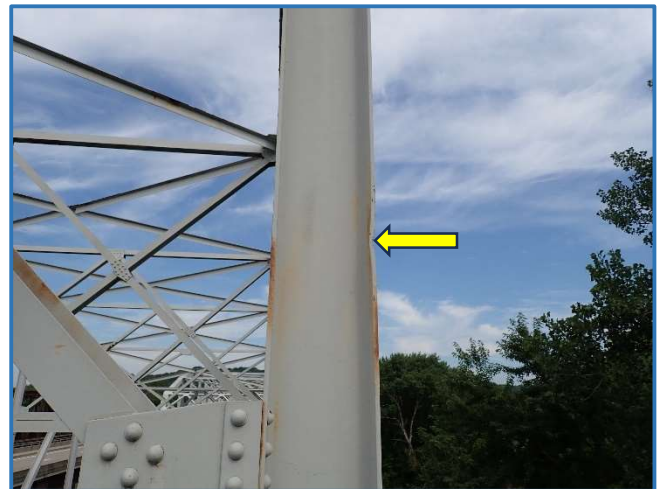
Impact damage to north flange in Span 3, North Truss, at Panel Point 6, looking west
